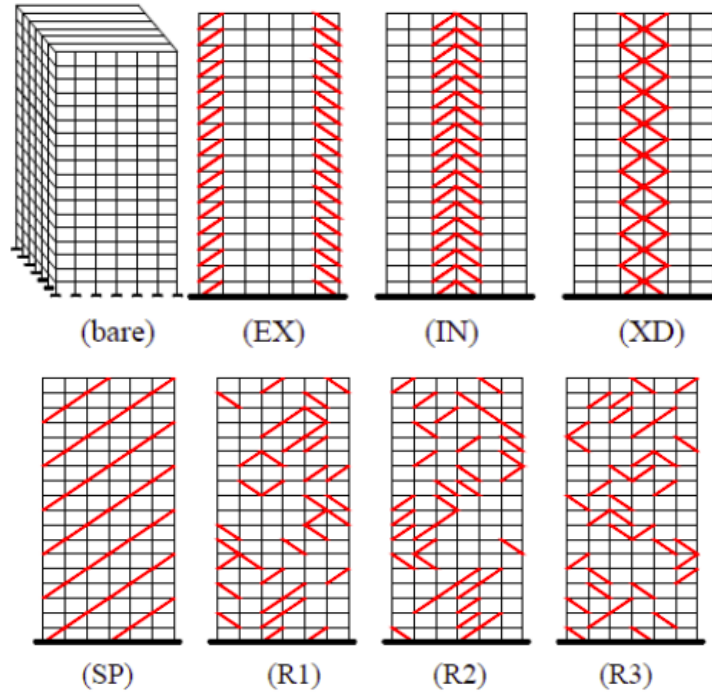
The proposed horizontal brace-damper arrangements (Mezzi 2010)
